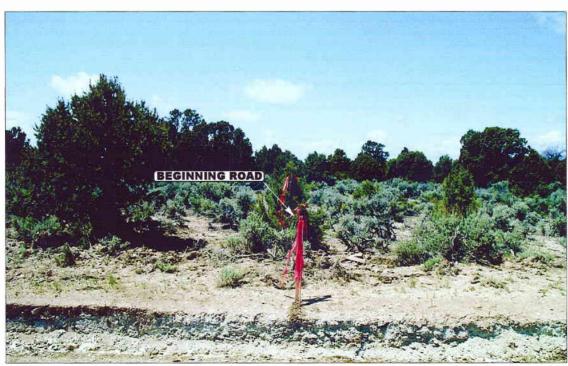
PHOTO: VIEW OF BEGINNING OF PROPOSED ROAD
